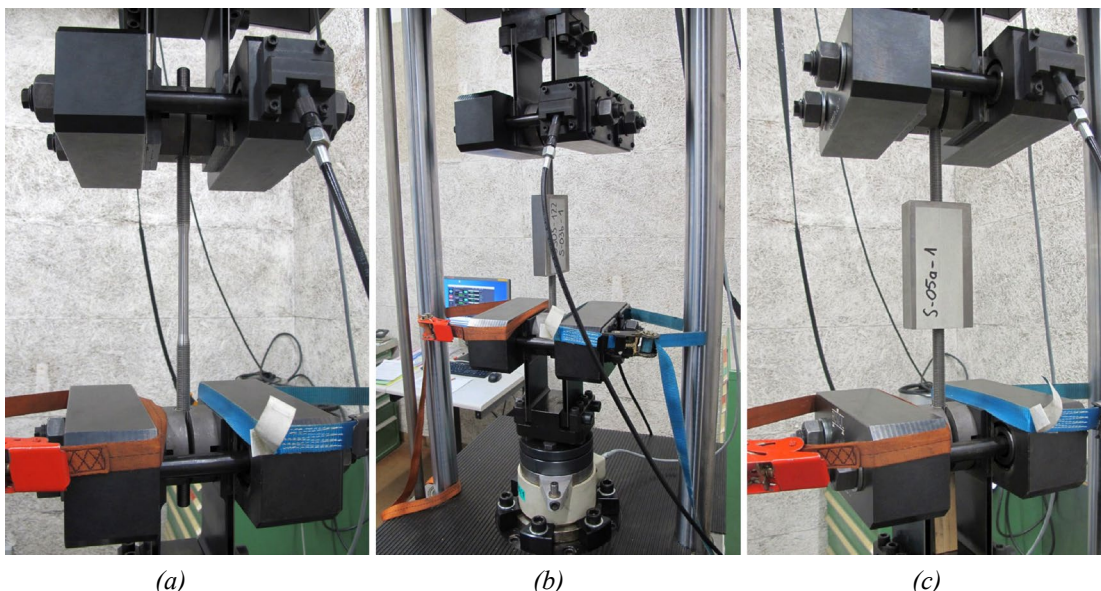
Installed specimens; (a) threaded rod machined to $\phi 11.5$ mm, (b) connection “S-03b-1”, (c) connection “S-05a-1”
